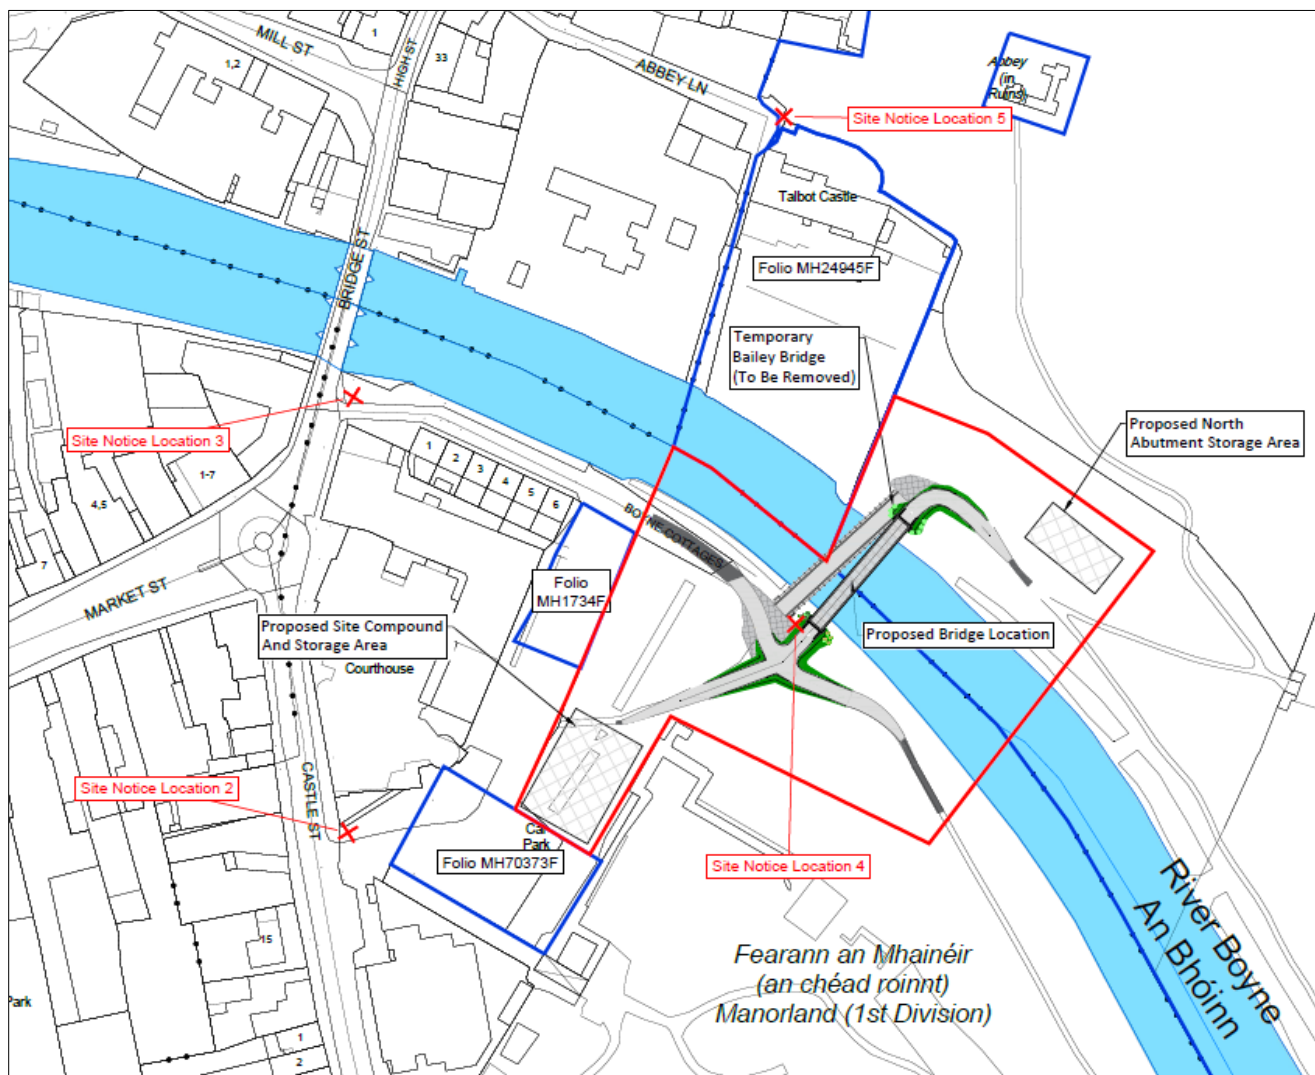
Proposed Pedestrian Bridge Location and Red-Line Site Boundary
